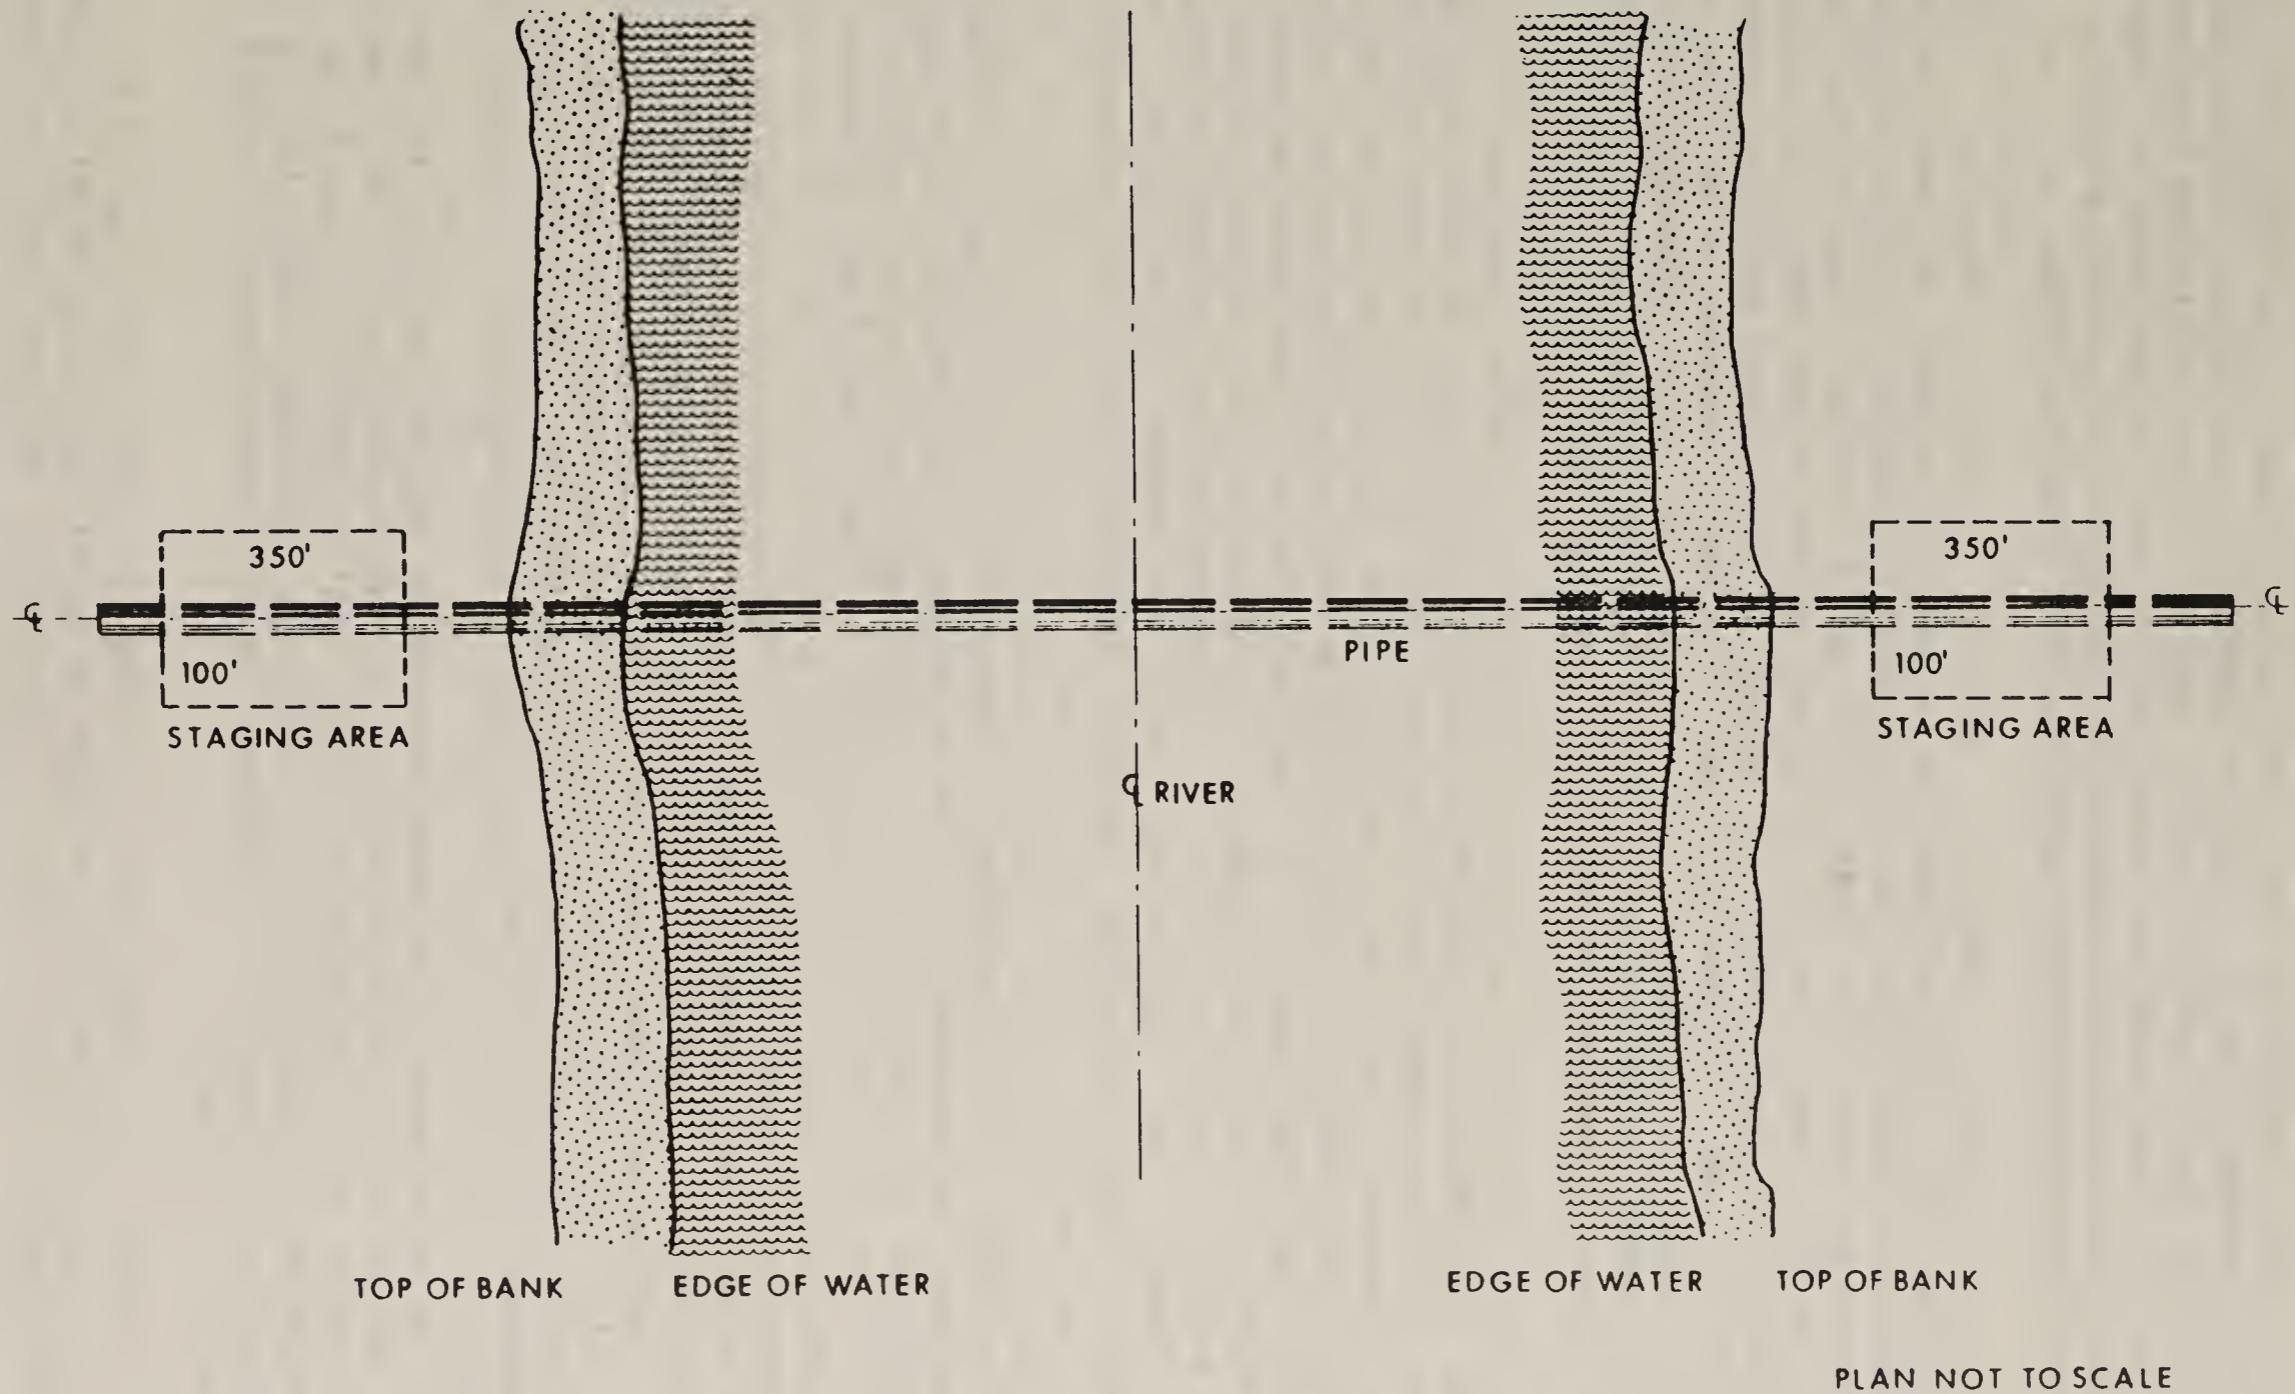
TYPICAL PLAN FOR PIPELINE RIVER CROSSING
